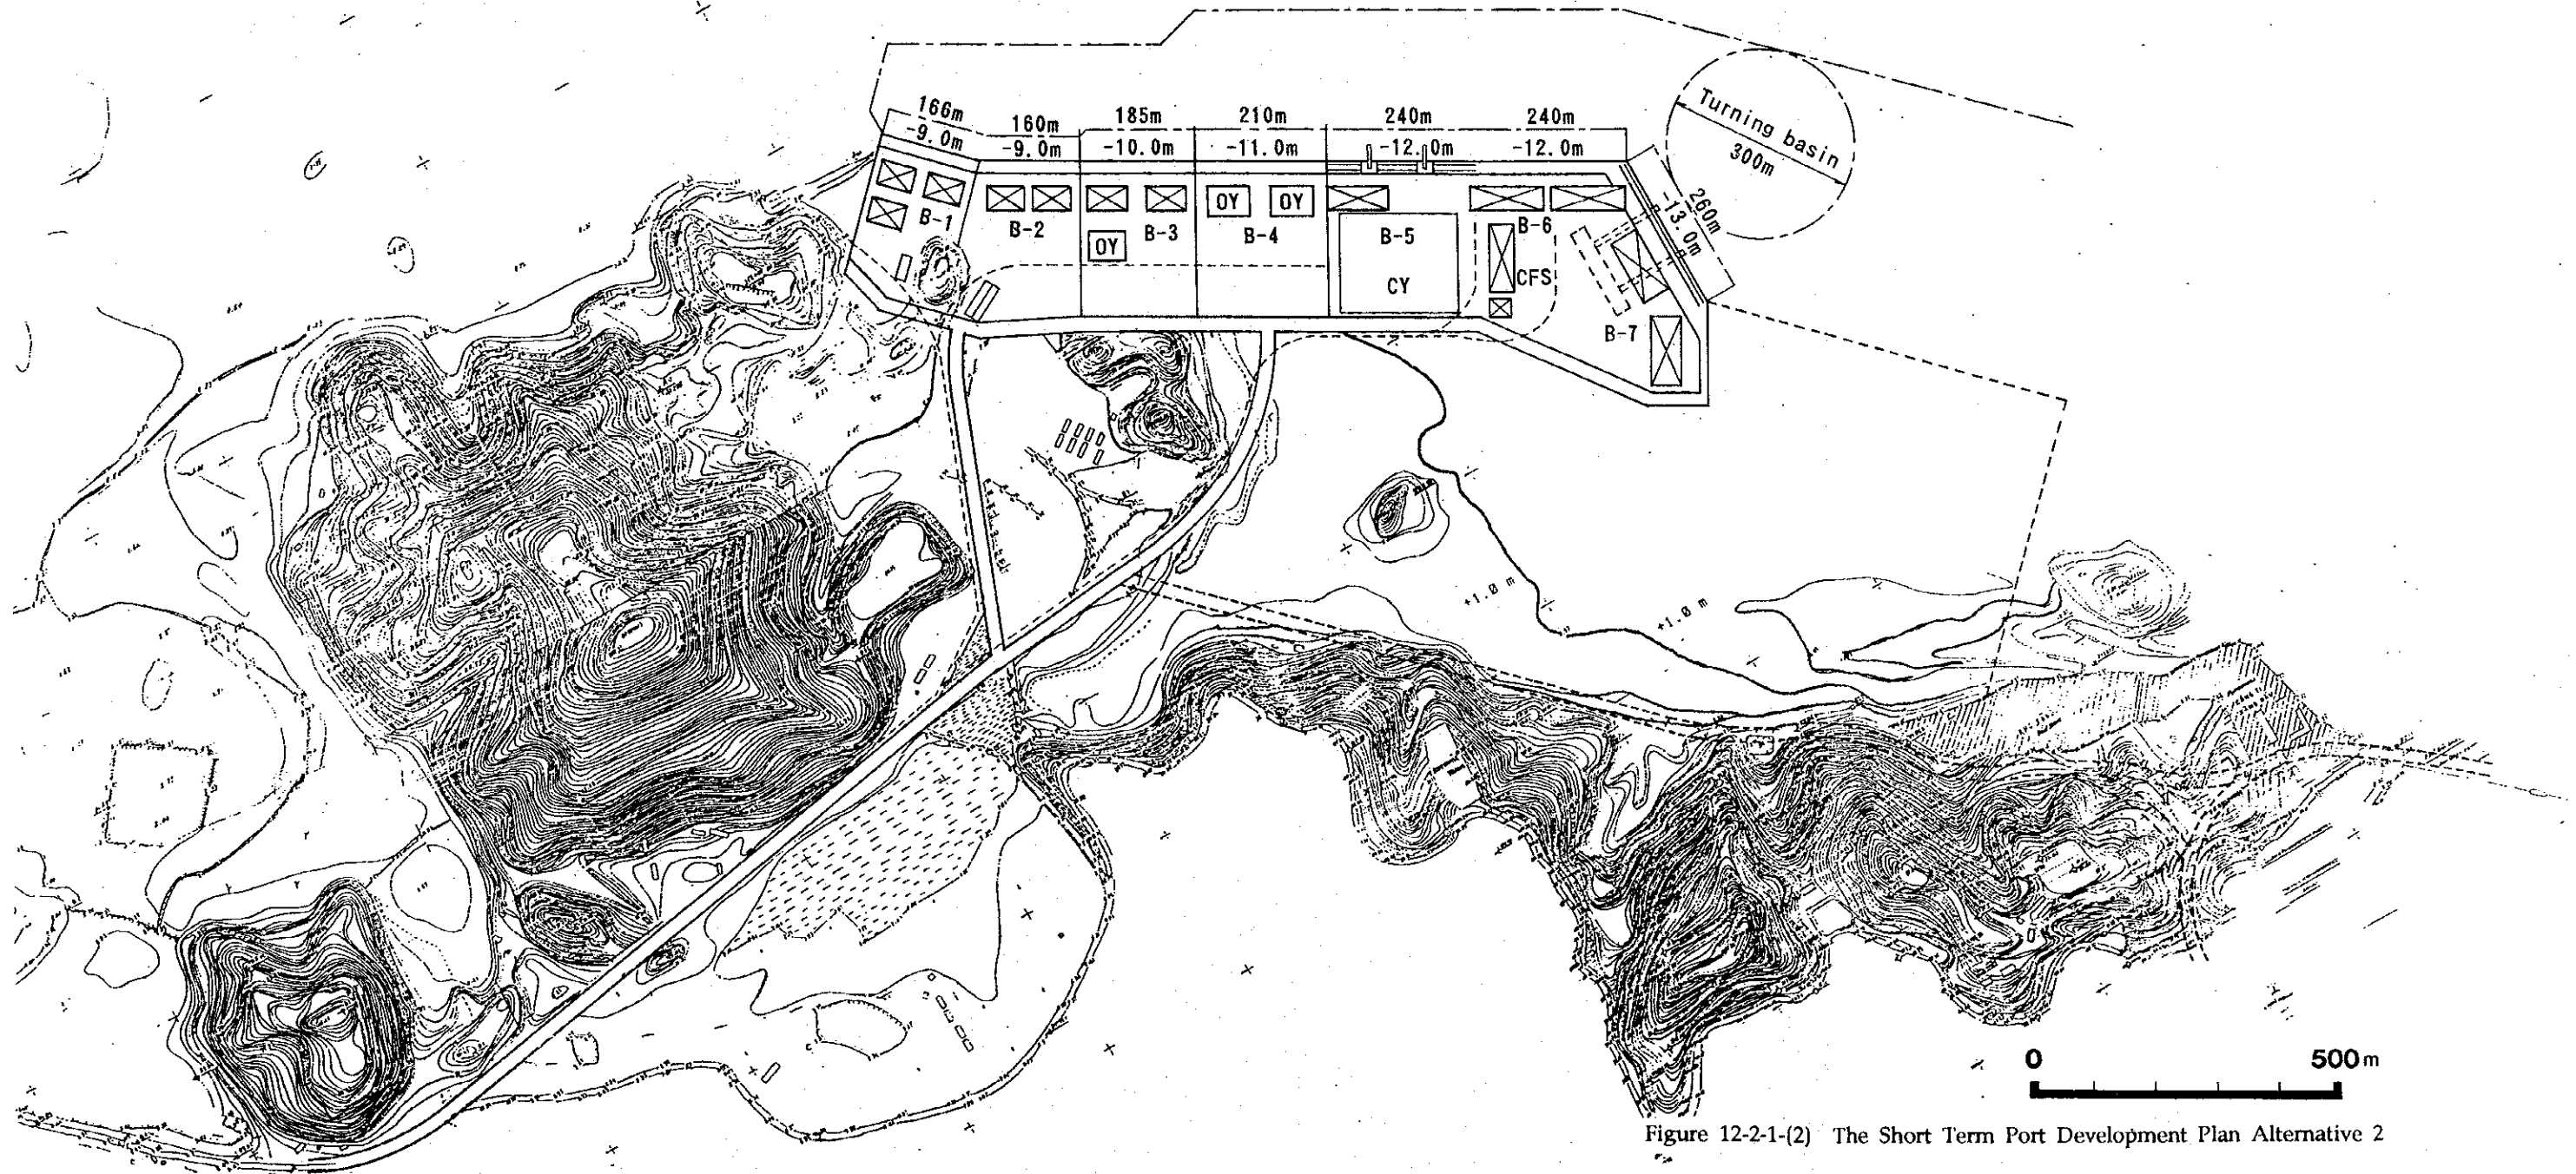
(2) The Short Term Port Development Plan Alternative 2
